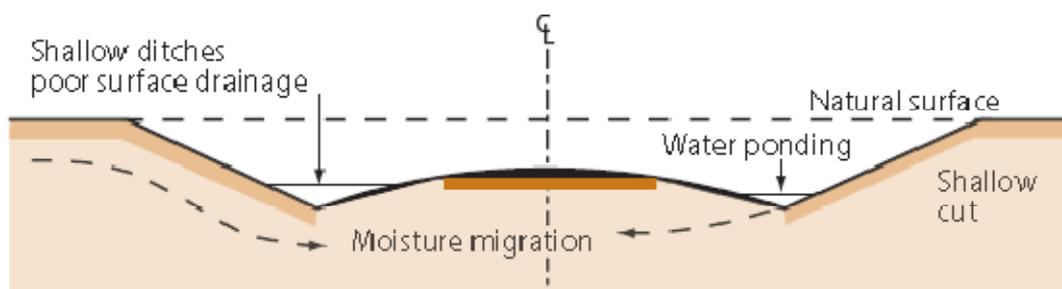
Potential drainage problems associated with depressed pavement construction.
